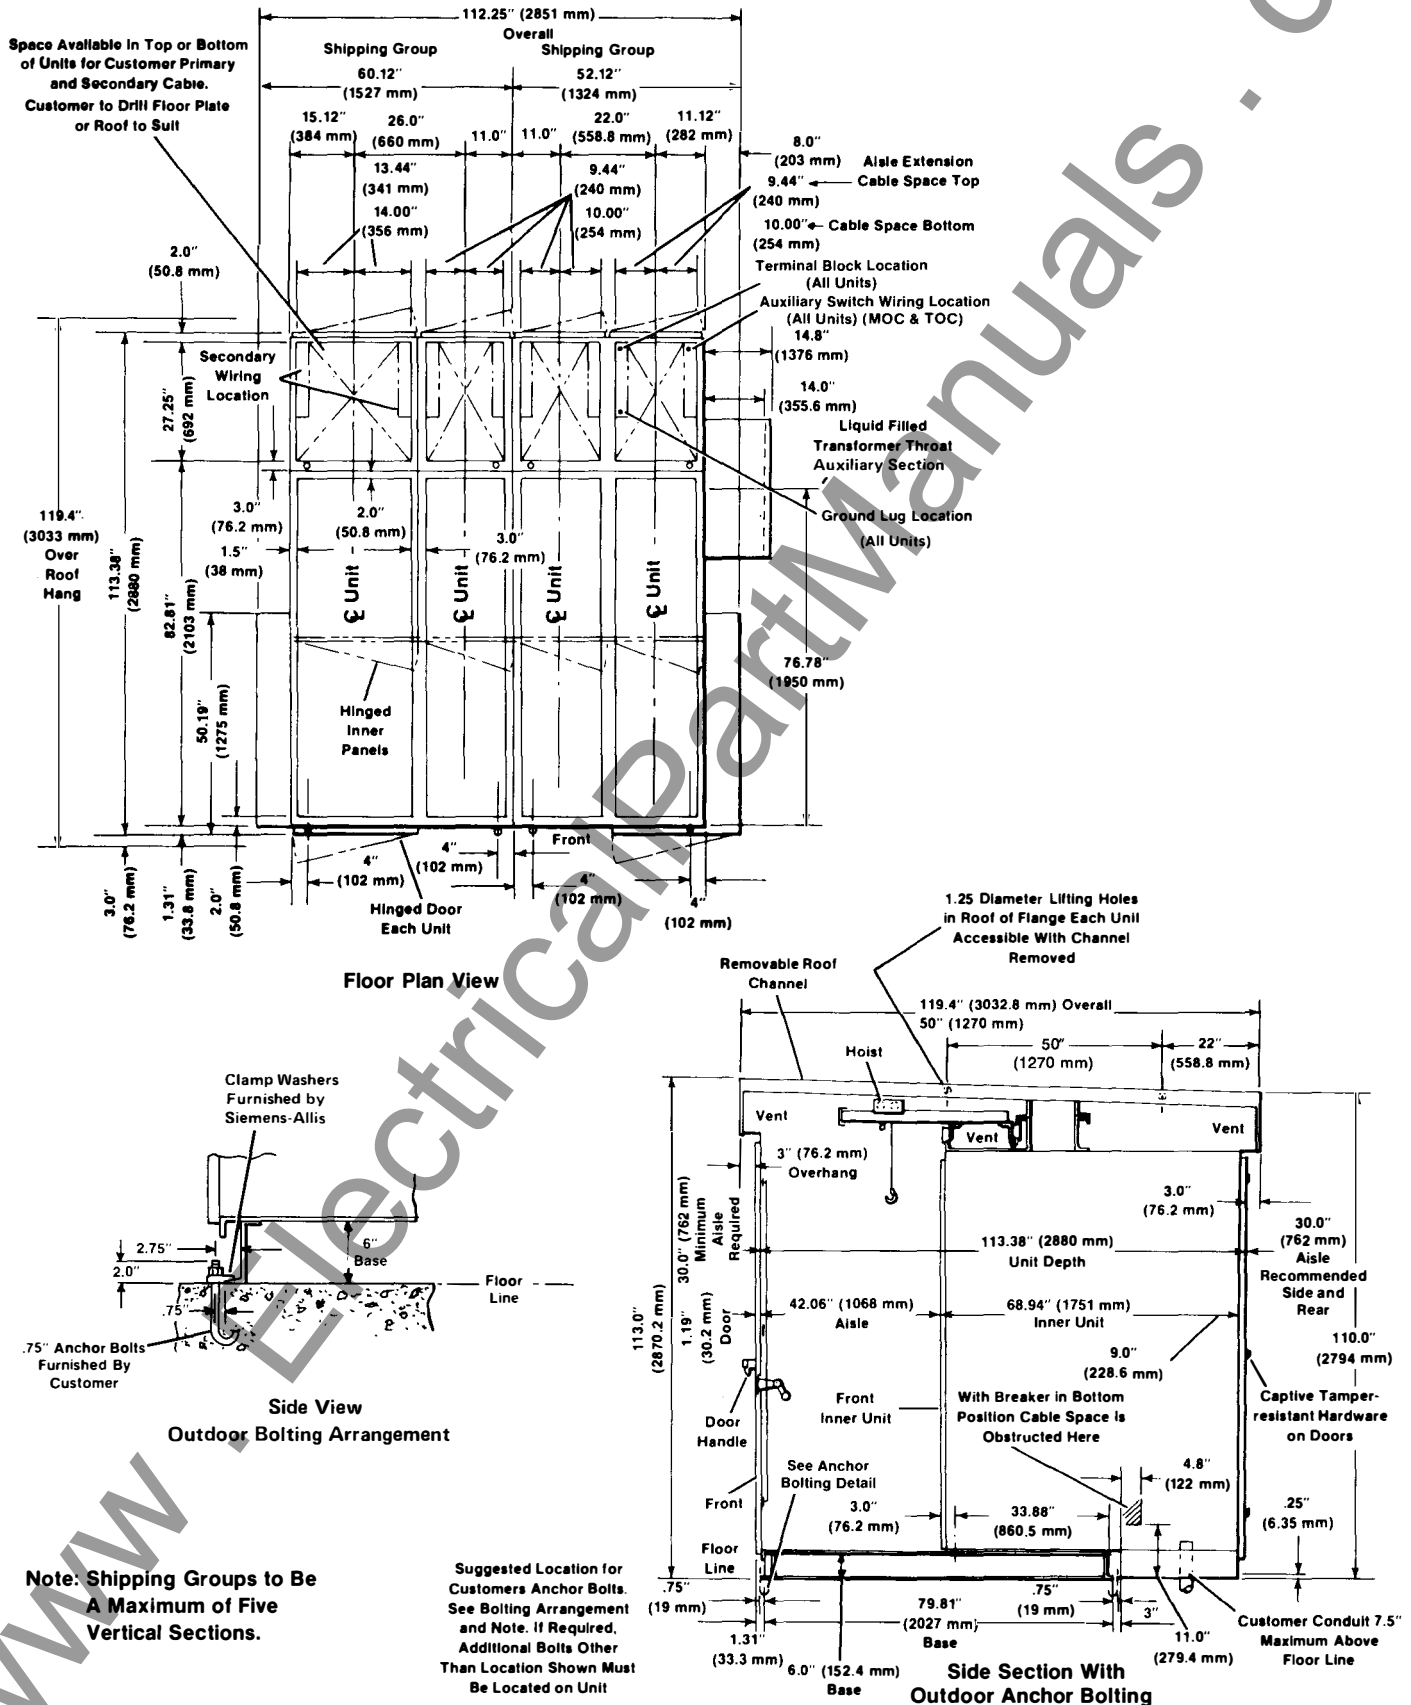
Dimensions, Floor Plan and Side View Type "SR" Outdoor Switchgear.
